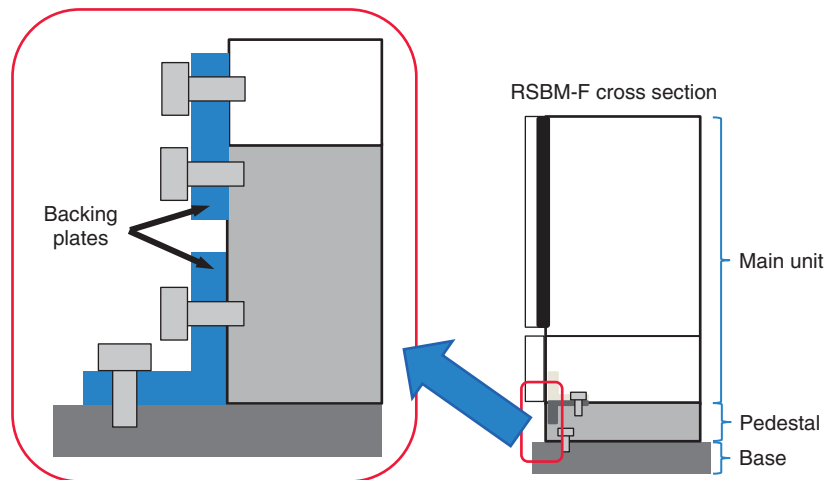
Proposed technique of using backing plates to provide screw holes for securing bolts.
